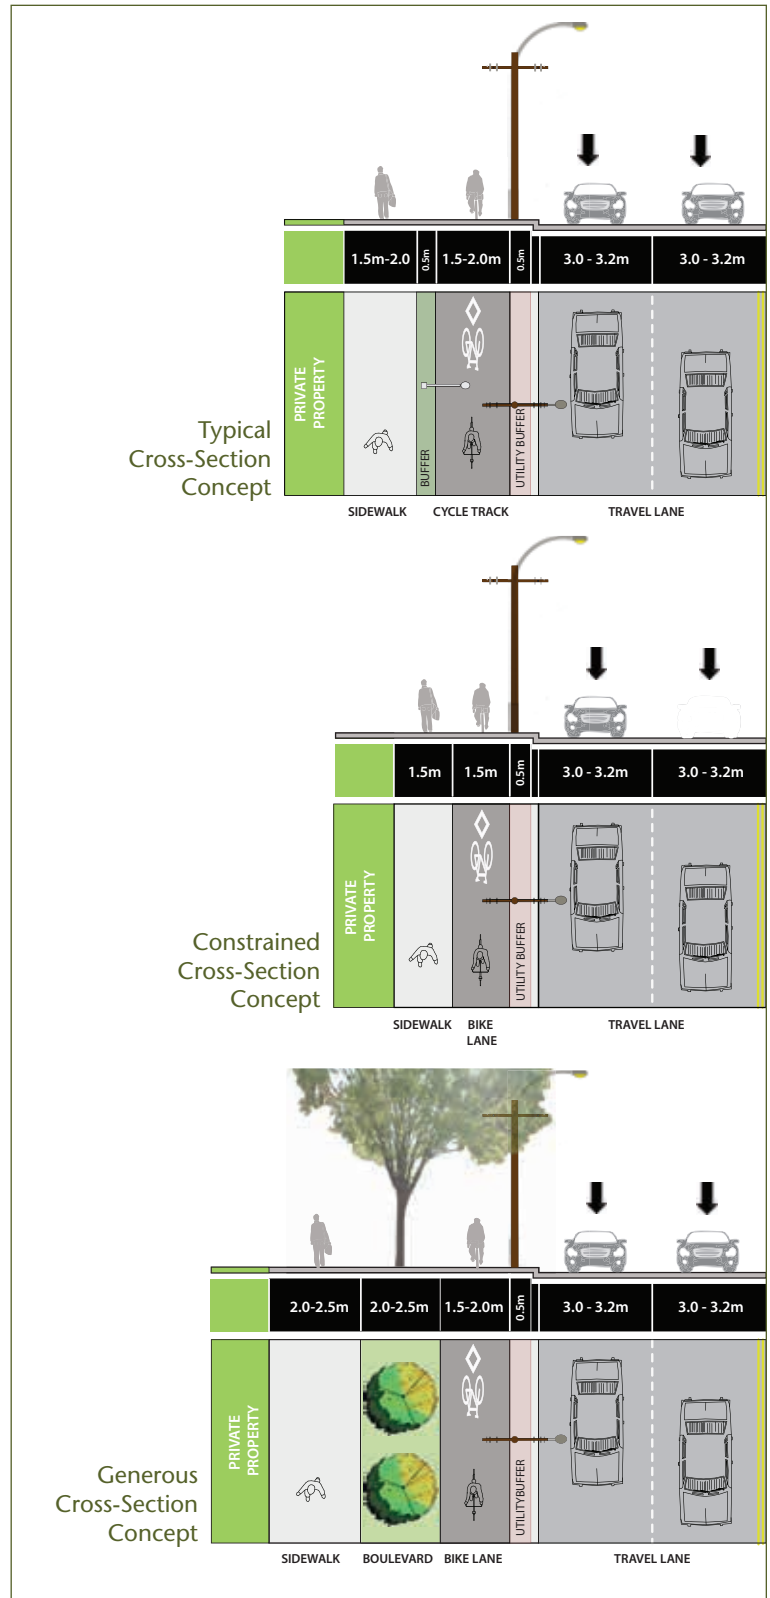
| Interim Shelbourne Street (half cross-section shown) Design Concepts
